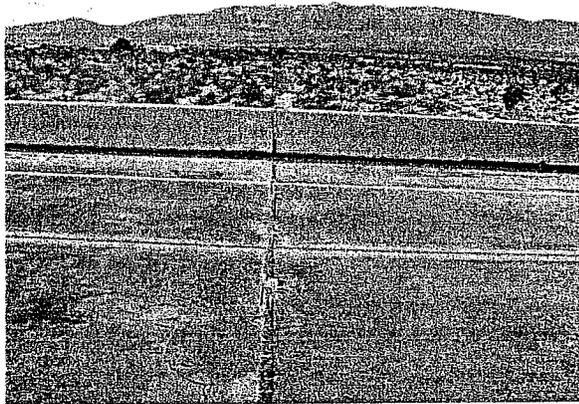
Bridge 53-2331 typical deck joint seal (non-suspect)
